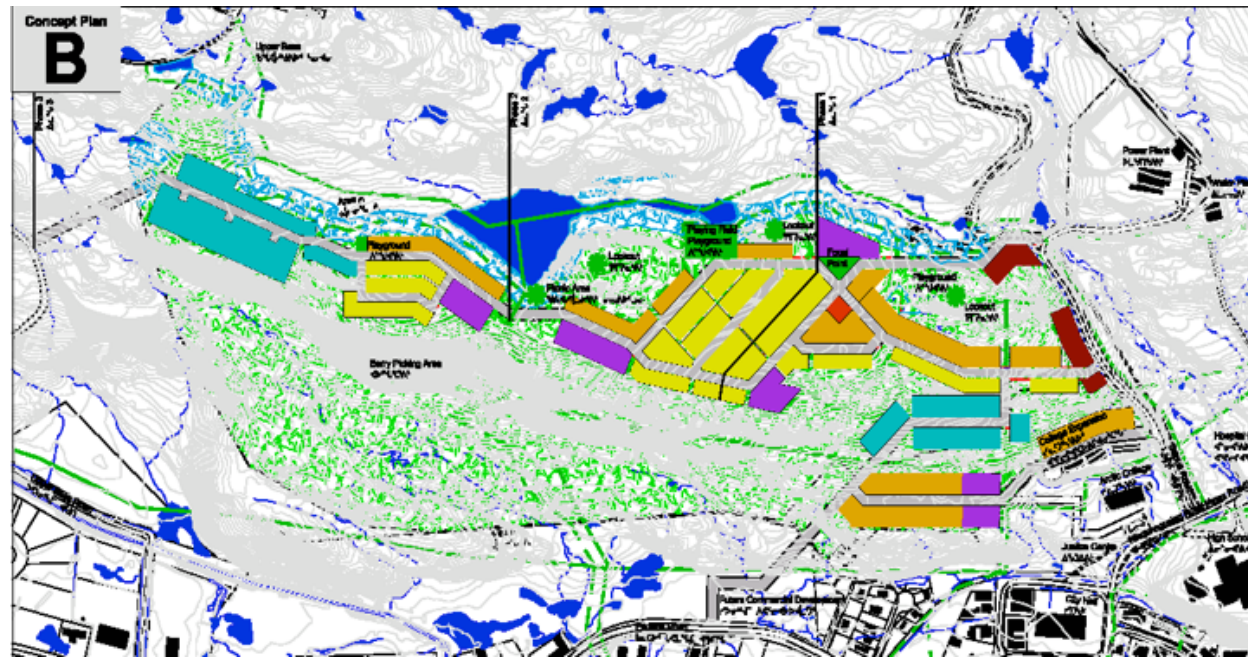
The Plan for the Plateau Subdivision in Iqaluit (Fotenn 2004)
